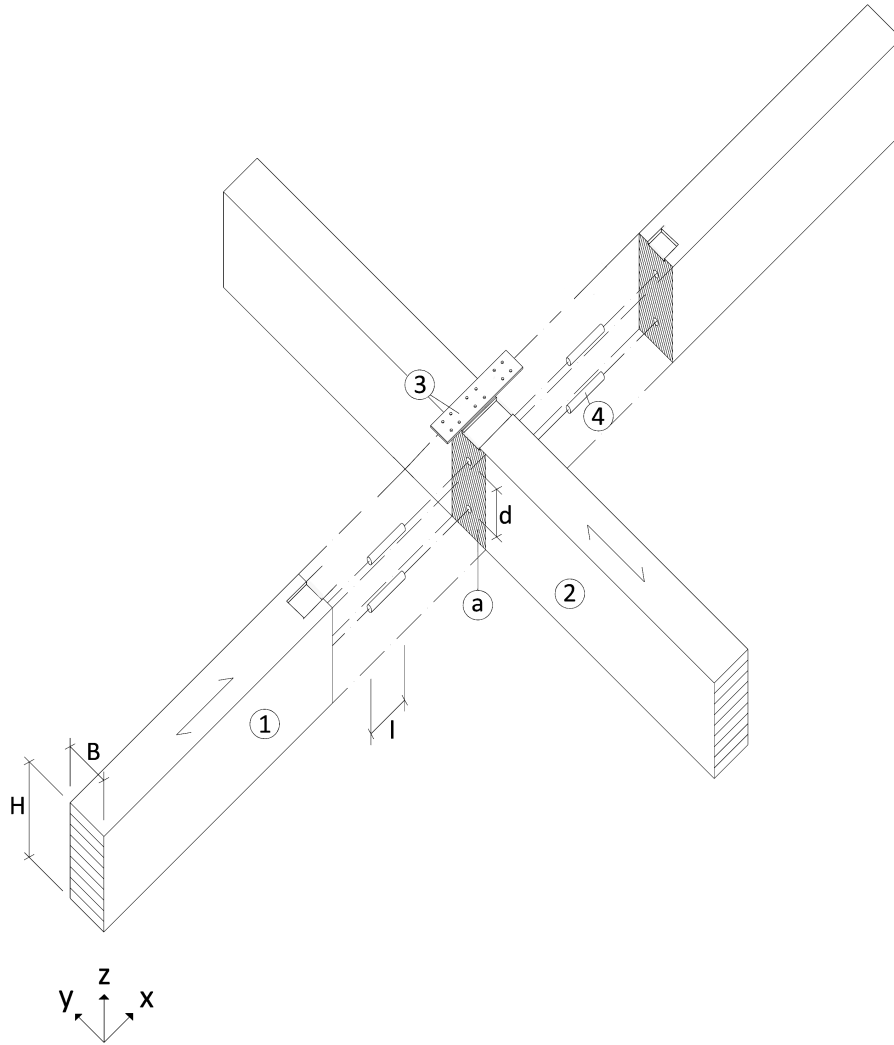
Basic contact joint. Diagram showing the assembly and components of the joint
